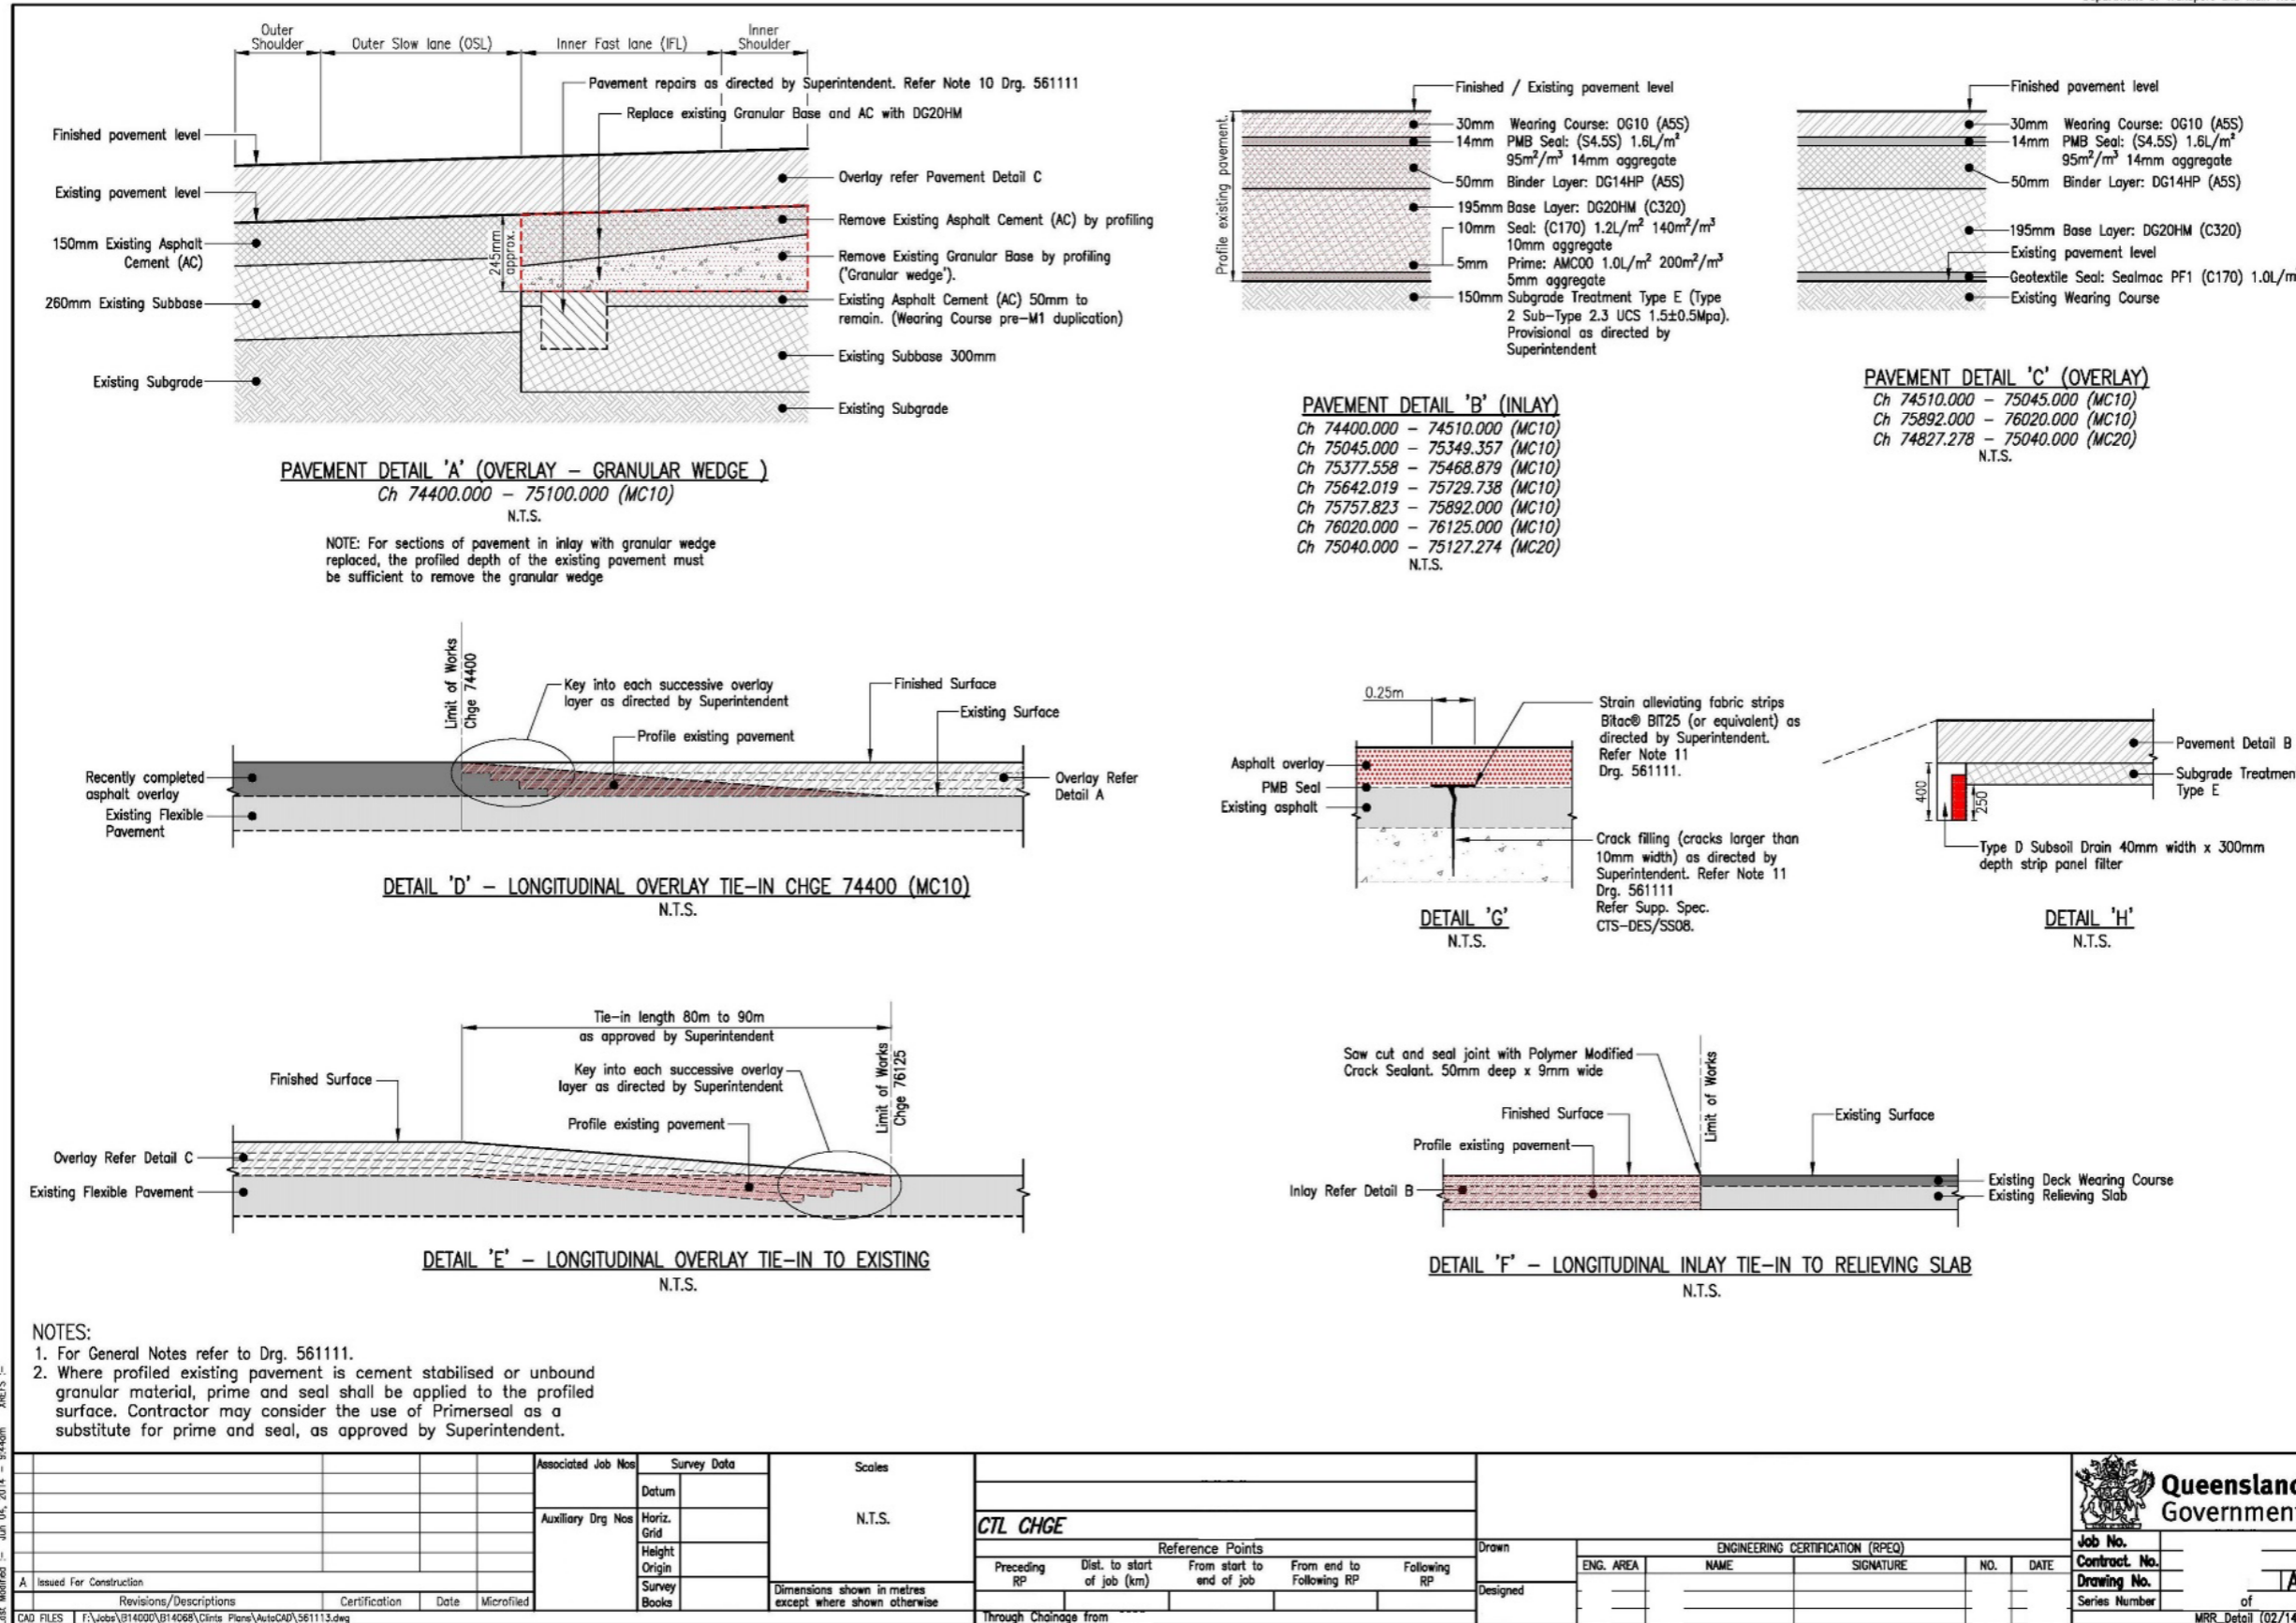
(d) – Pavement details – generic example 4 – sheet 1 of 2
